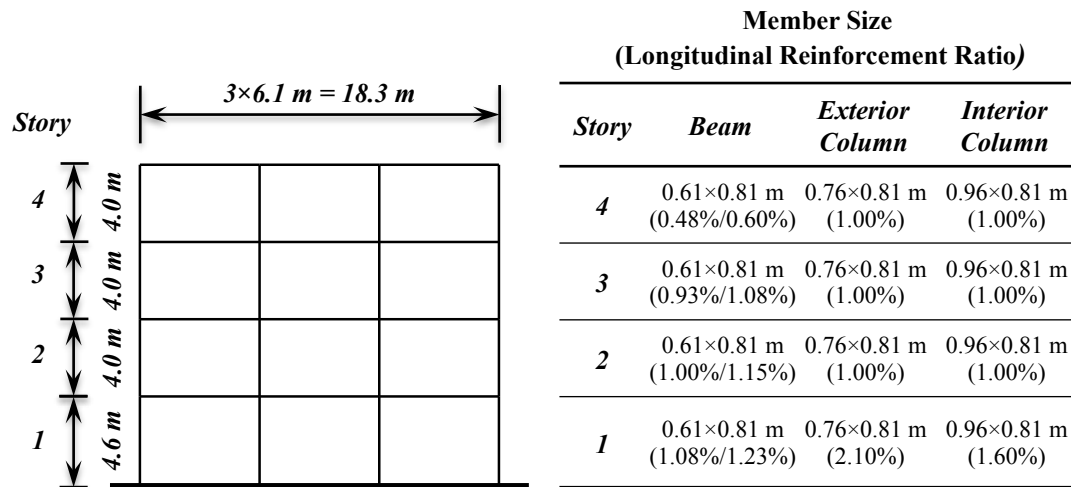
Elevation of building RC-4 as well as the member size and reinforcement ratio of the beams and columns.
